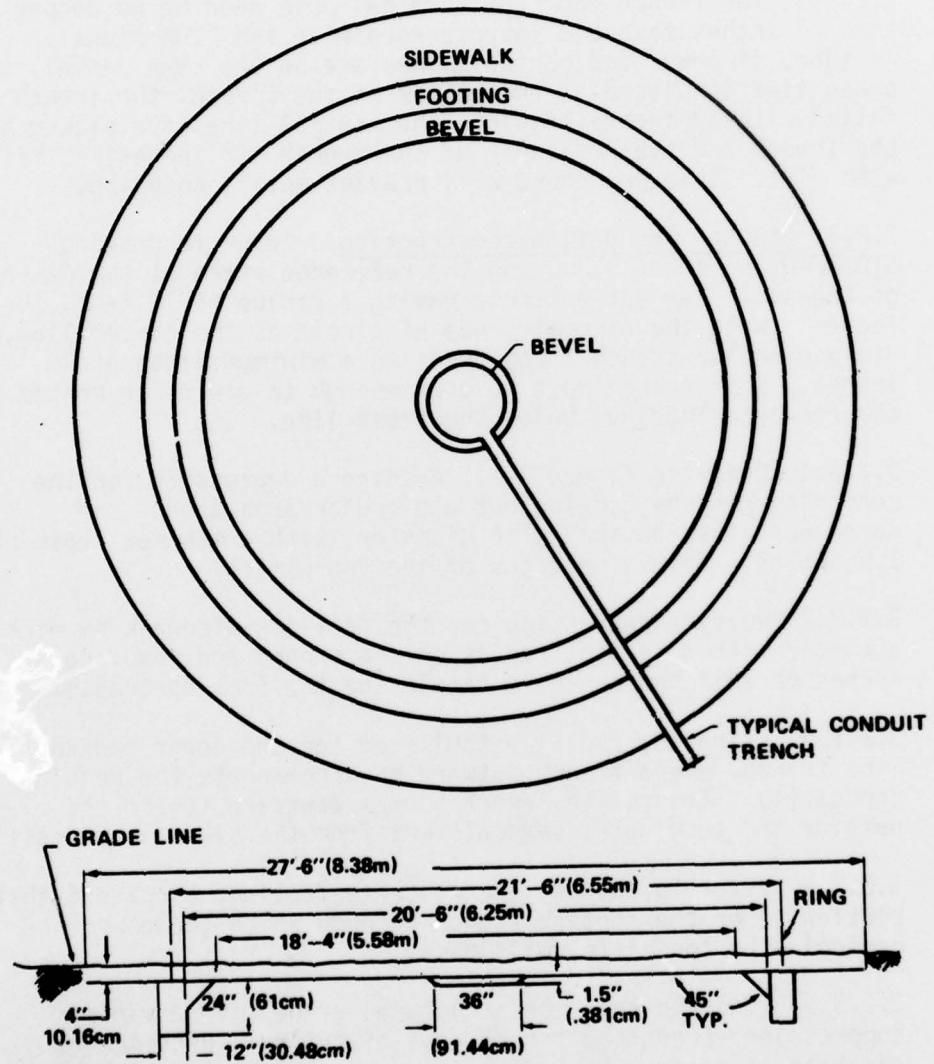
Twenty-one Foot Shelter Excavation and Footing.
